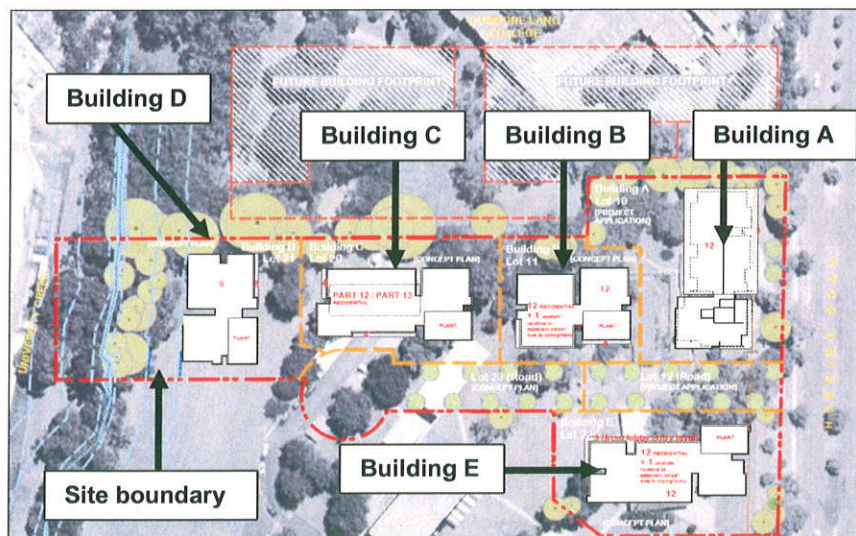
Site Context Plan Demonstrating the Layout of the 5 Buildings and Internal Road. Building E, the subject of the MOD 4 is located in the bottom right corner.
